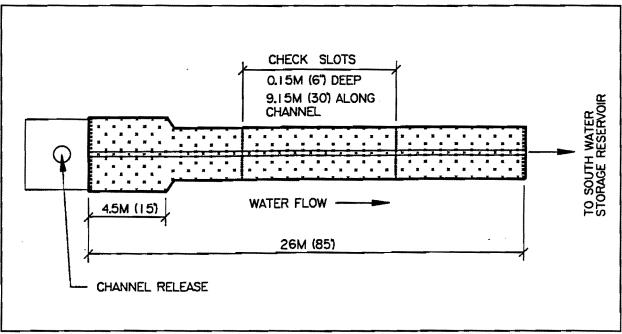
LANDLOK® ECRM 450 Installation Plan.
